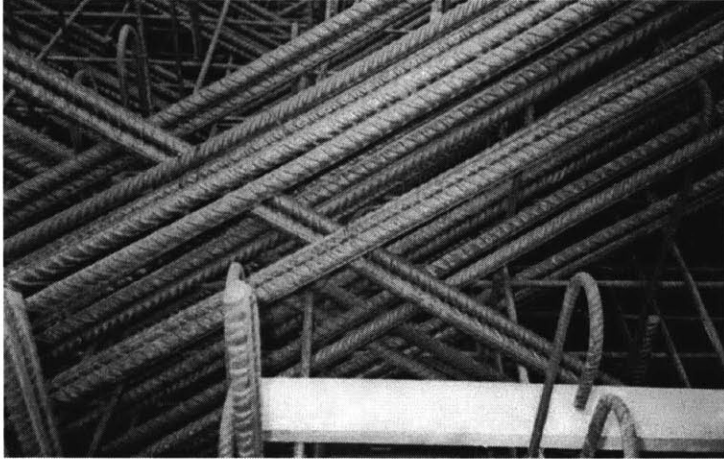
Reinforcing bars located in the base of the Orleans Bridge tripod
